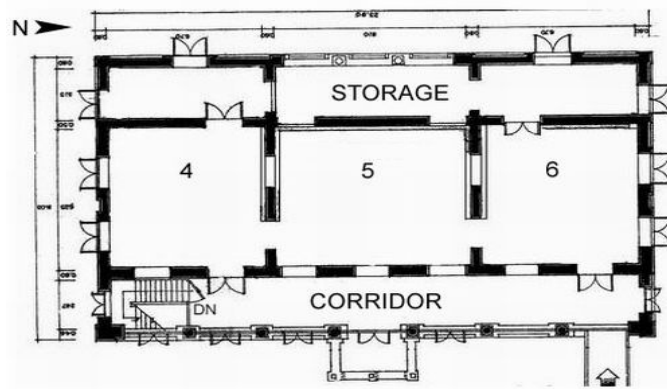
Tamnak Pannarai : Upper Floor Plan.
